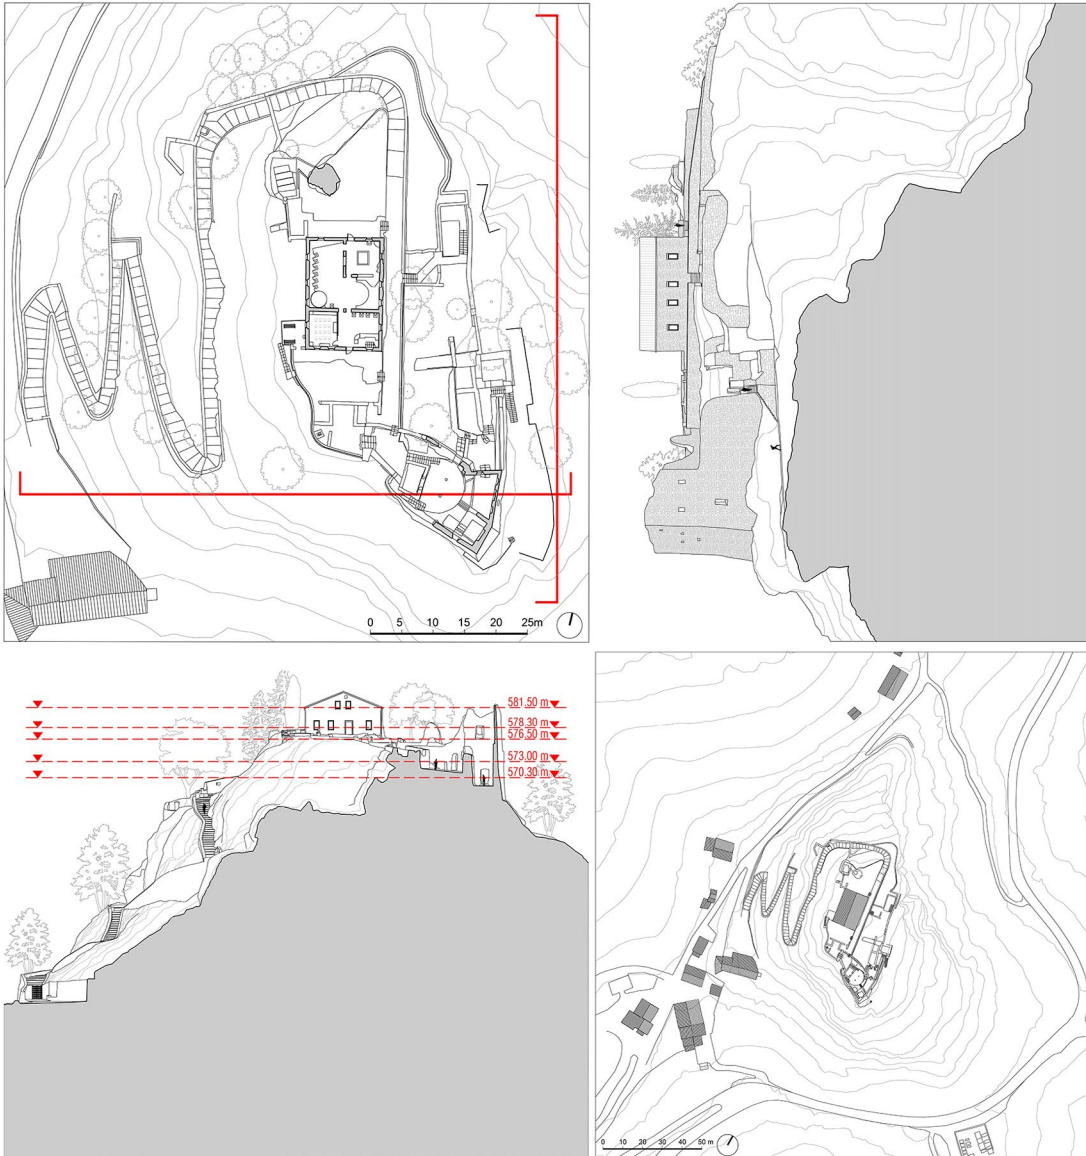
Representation of the archaeological area: general and detailed floor plan and two elevations/sections.
